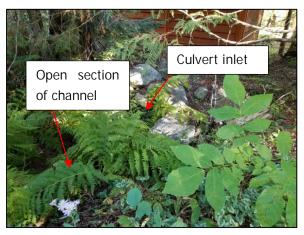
Section of unnamed ephemeral stream at northeast corner of property, Sep 8, 2021.
